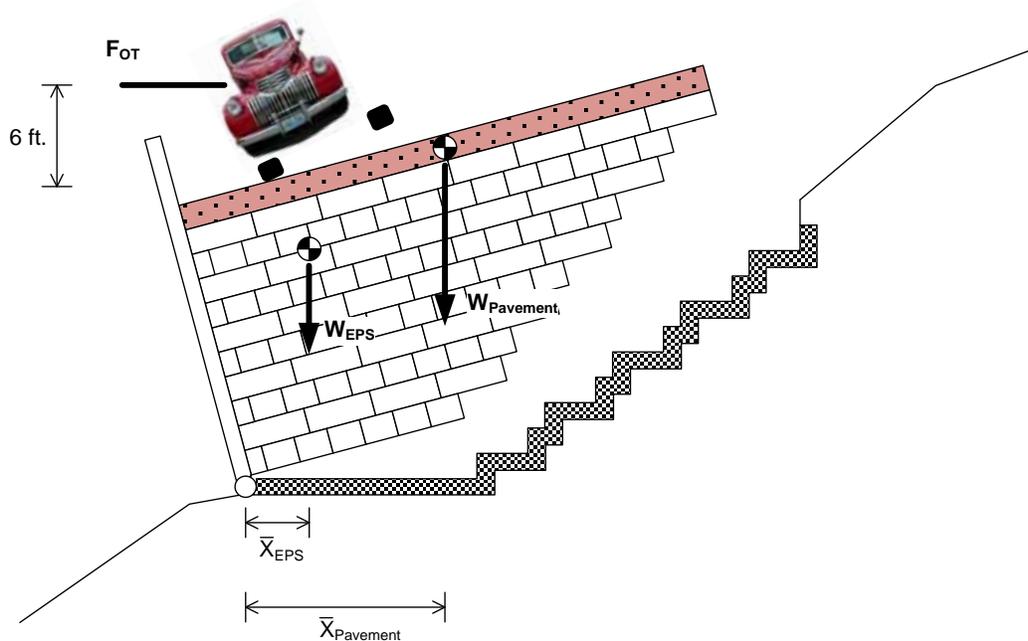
Cross-section view of model used to evaluate centrifugal force overturning.
